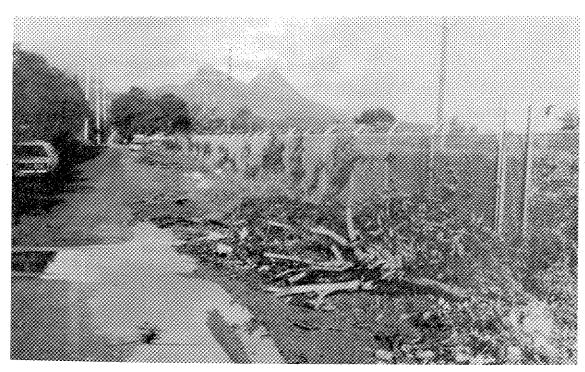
Garbage and orchard debris dumped along roadside blocking drainageway. Olomana Peak in the background.
